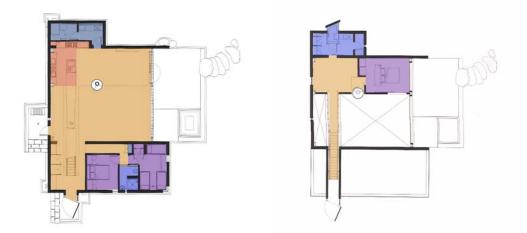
Floor Plans. The ground floor is a large open space with a kitchen in the back, children's bedrooms to one side, and mechanical need to the other. The second floor contains a sitting room and master bedroom lofted above the ground floor open space, and a master bathroom.
